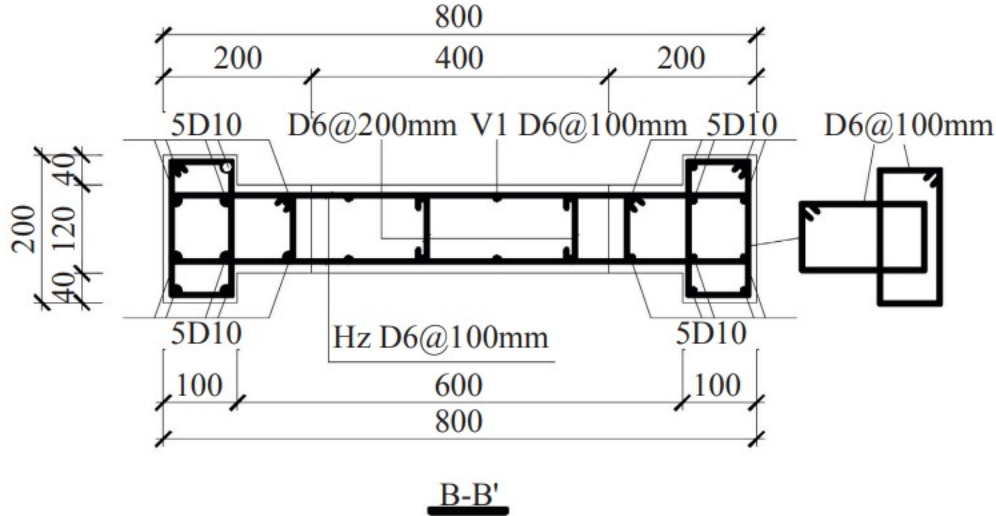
Cross section and reinforcement detailing of wall GNW [23]
